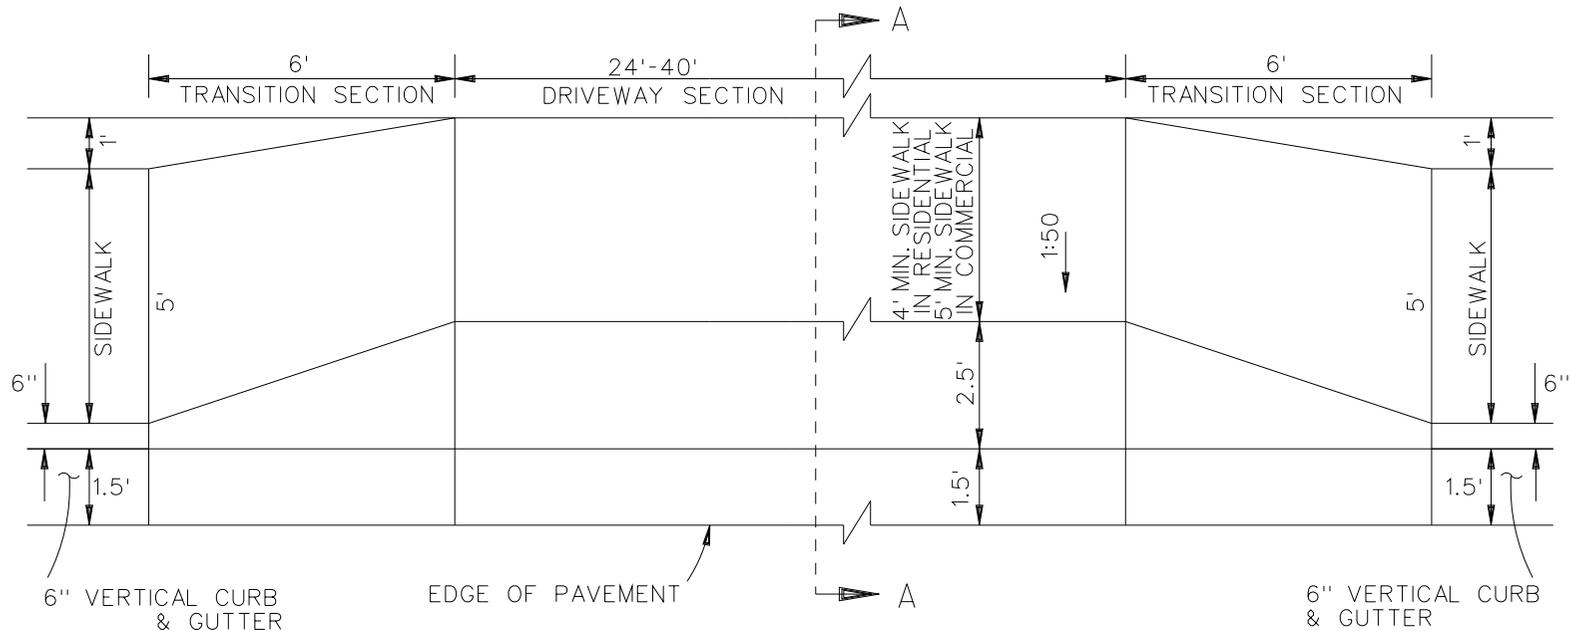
P	COP STANDARD DETAIL	MODIFIED ROLL CURB DRIVEWAY SECTION	DETAIL NO. 2-18P
